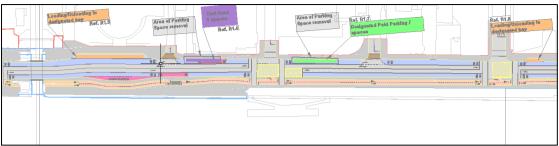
Proposed scheme design and parking changes along North Wall Quay (between Guild Street and New Wapping Street).
